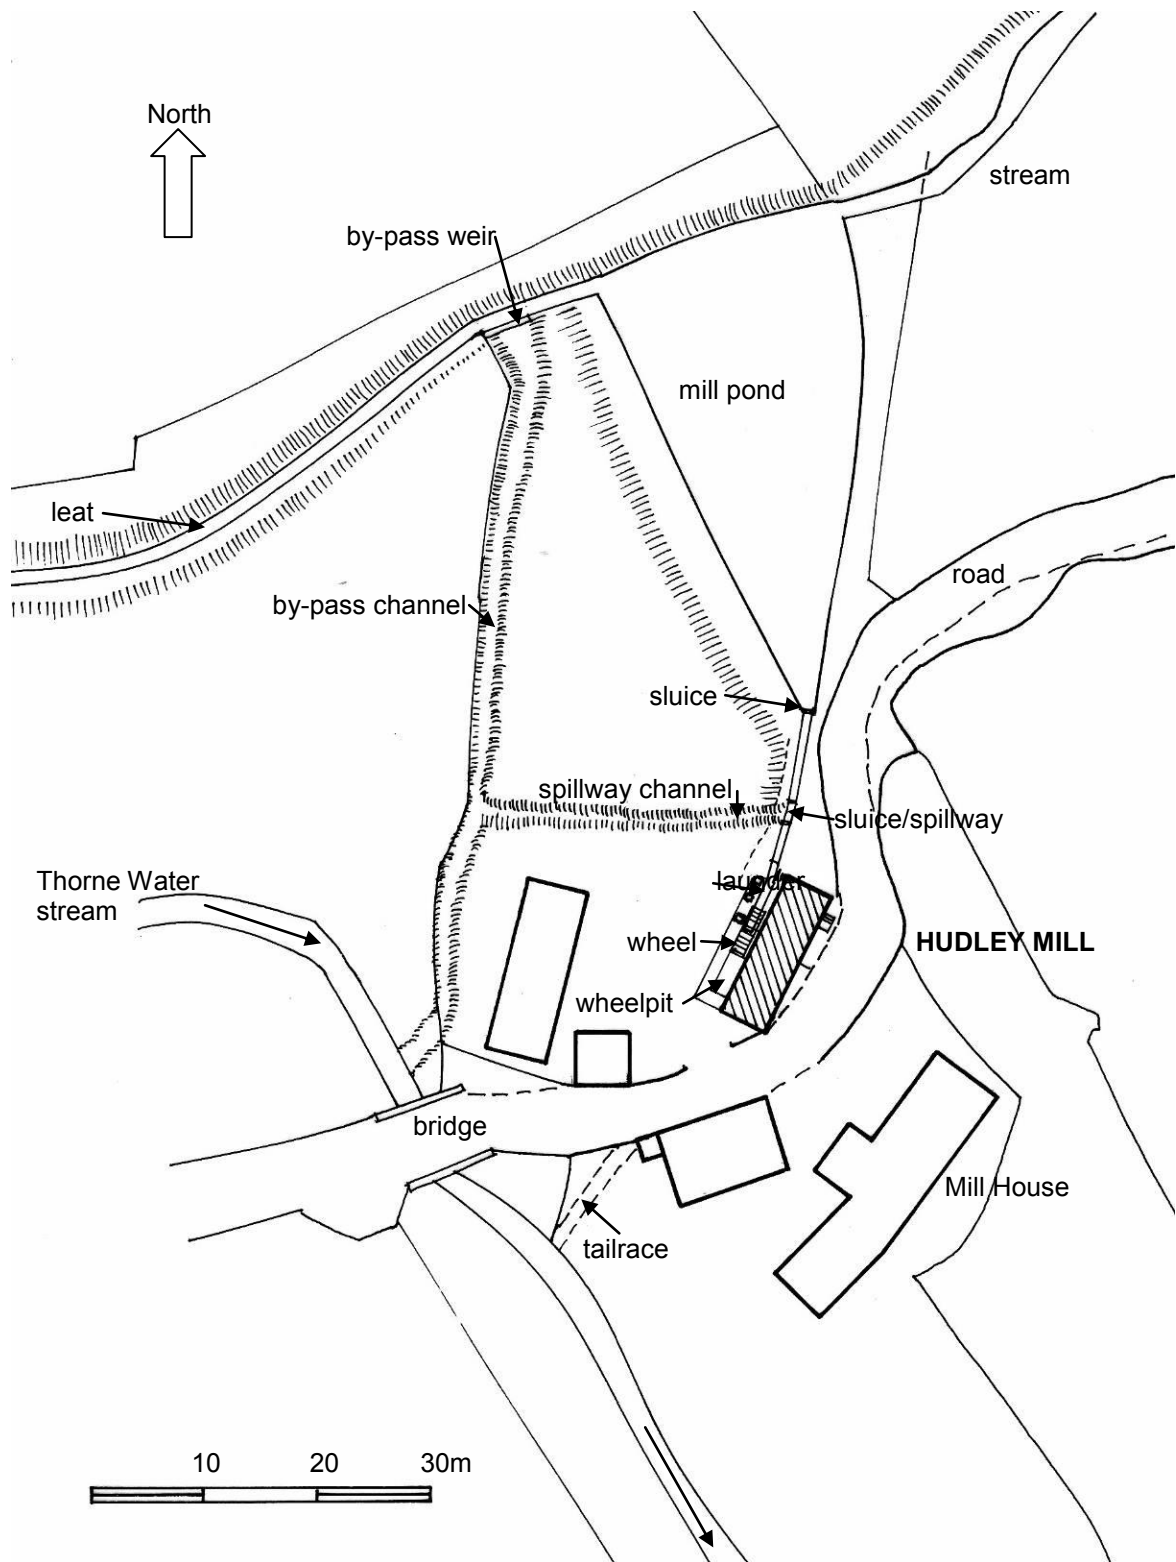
Hudley Mill, Charles: site plan showing principal buildings and mill pond
